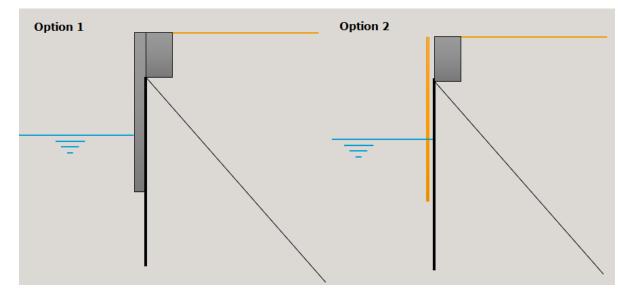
The proposed design change of a smaller capping beam. Option 1 is the standard quay wall design for short quay walls. Option 2 is the proposed quay wall design including a smaller capping beam. The orange line in front of the quay wall are the wooden fenders. Source: PoR internal report
